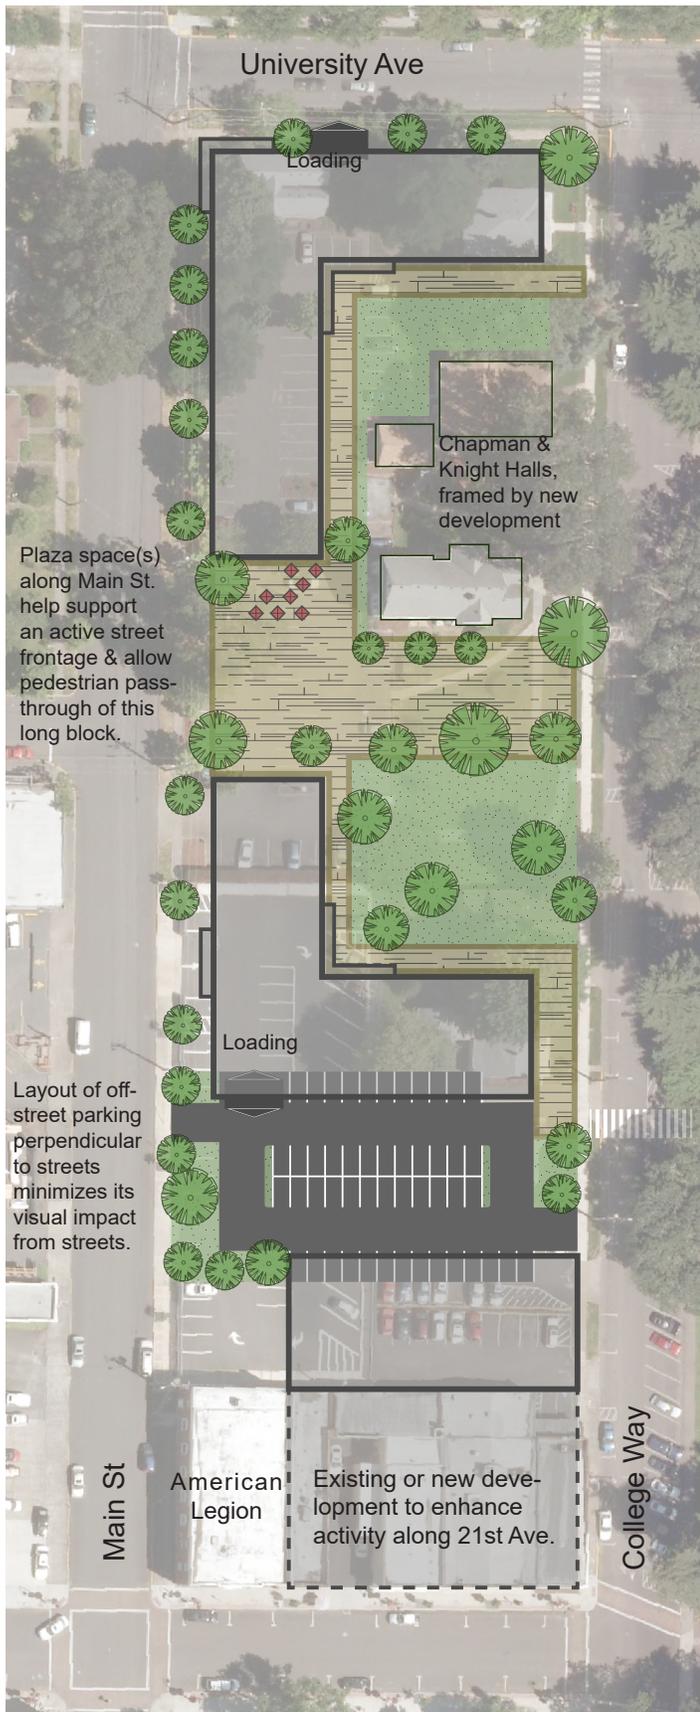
Redevelopment concept for the College/Main Block showing new student residential and an example layout that could support retail or other active ground-floor uses along Main Street.
